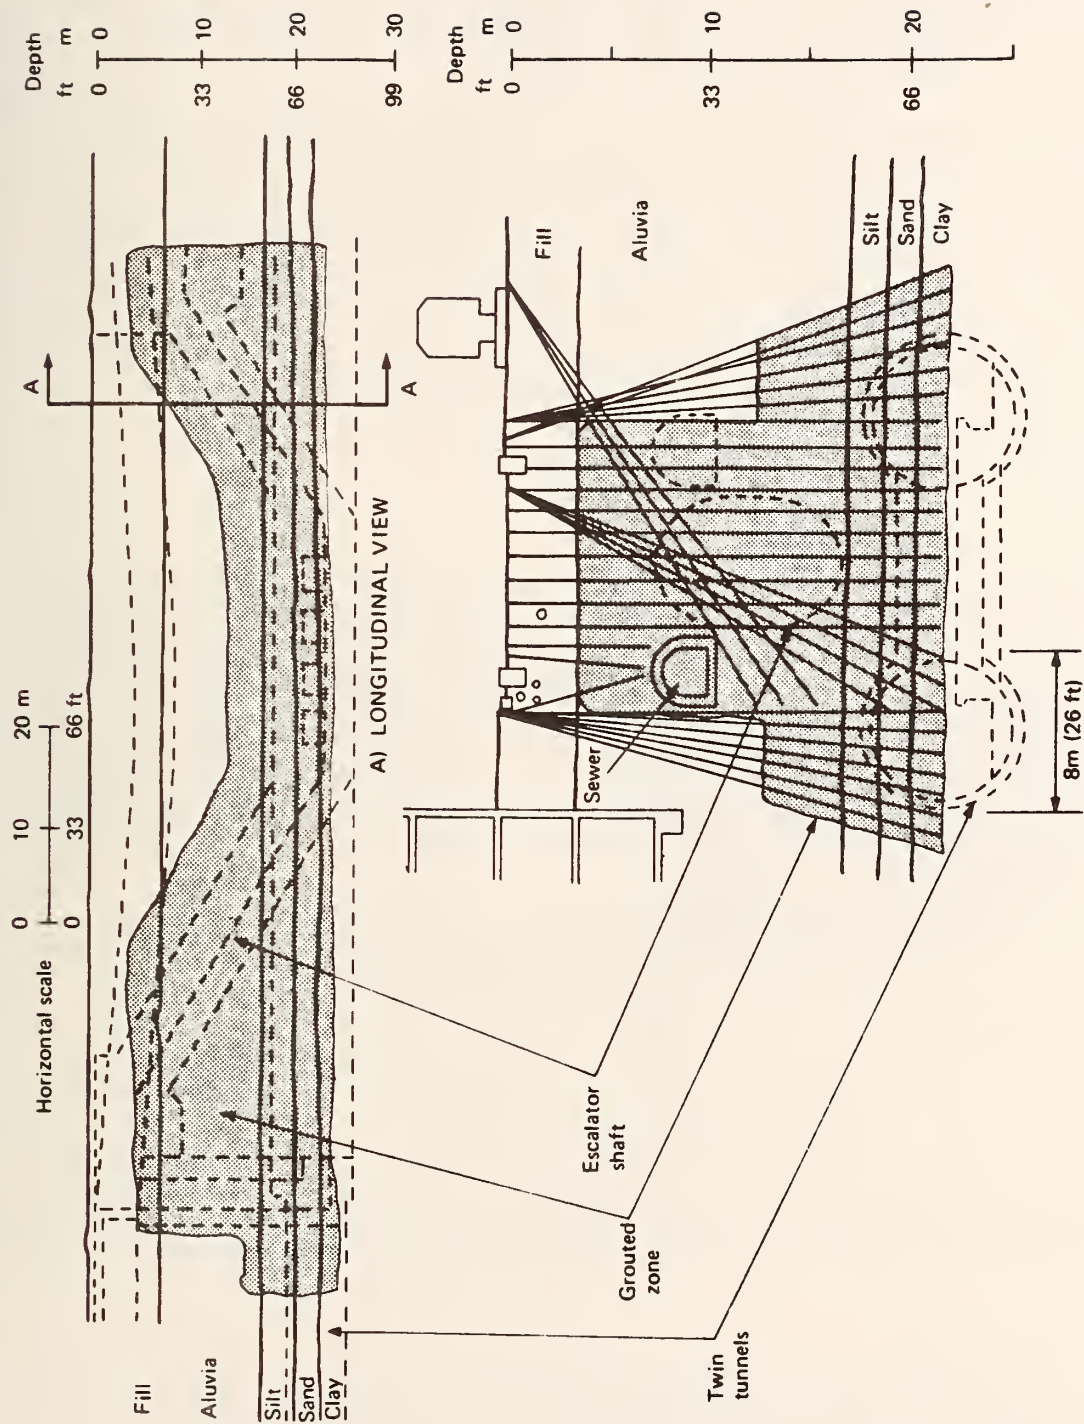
Grouting Scheme, Karplatz Station, Vienna (Ref. 201)
